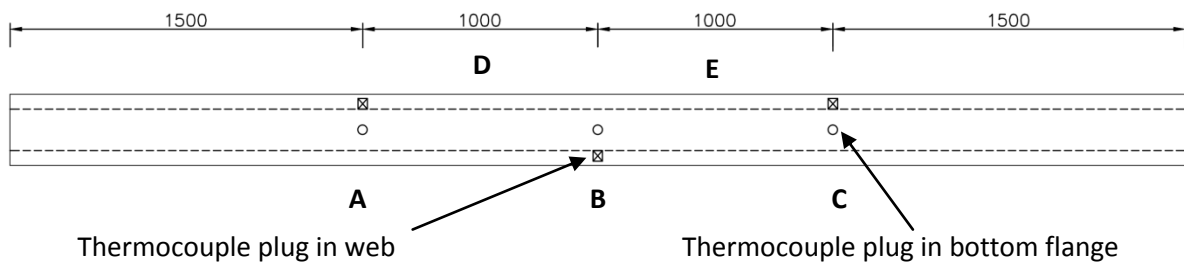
Plan view of typical test beam showing thermocouple plug locations (O: thermocouple plug in bottom flange X: thermocouple plug in beam web).
